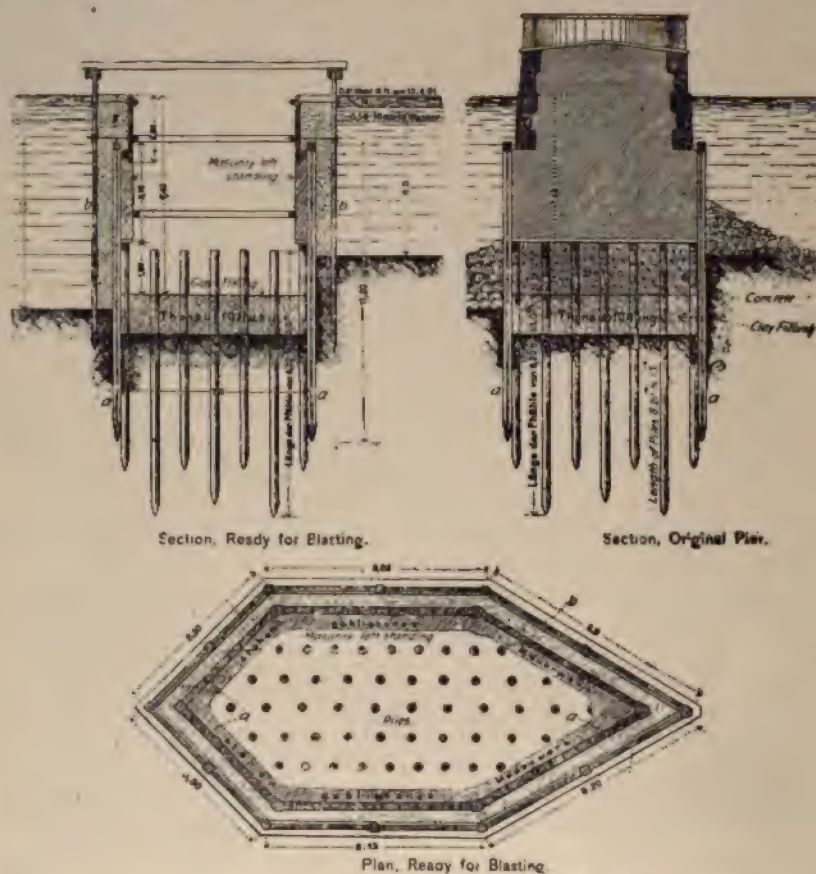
REMOVAL OF MASONRY PIER AT STETTIN, GERMANY.
